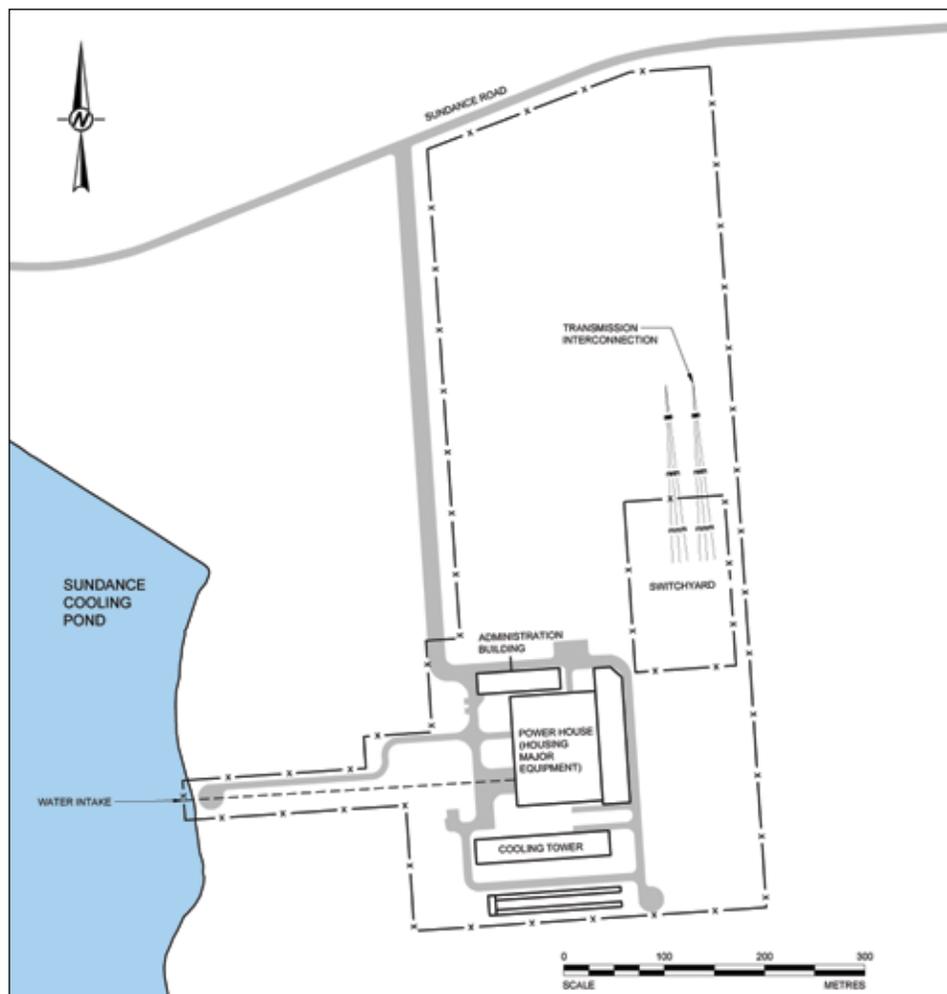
proposed site layout for Sundance 7, showing the location of some of the key features and buildings.
